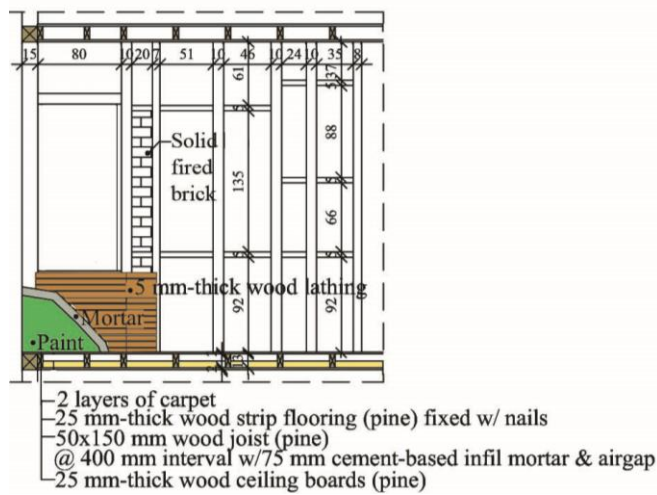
Elevation of Semi-Repaired-Wall 3 & section of Semi-Repaired-Floor 2 in 1/50 scale (Drawn by author).
